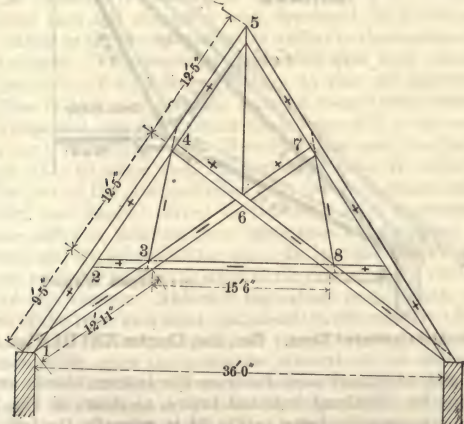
Scissors Truss. For Steep Roofs. (See Chapter XXVIII, Figs. 18 and 19)
